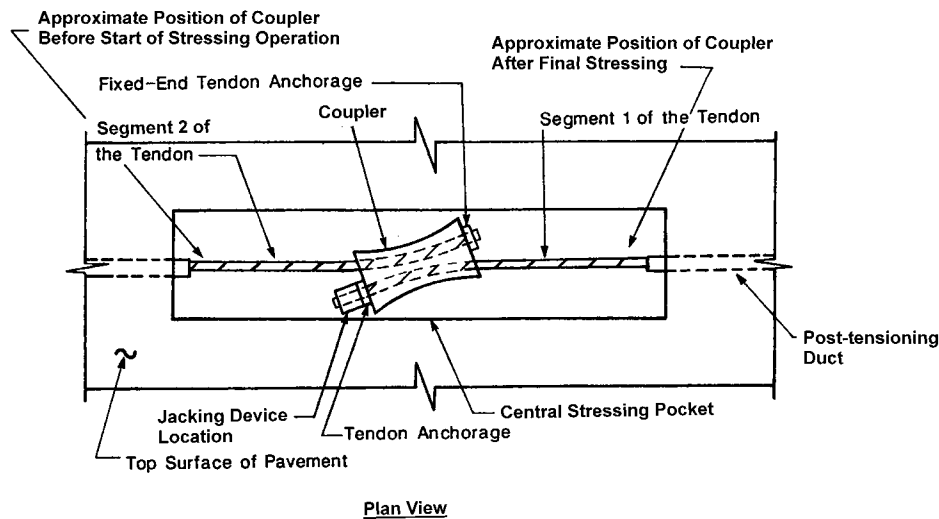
Plan view of central stressing pocket and coupler device (Ref 6)
